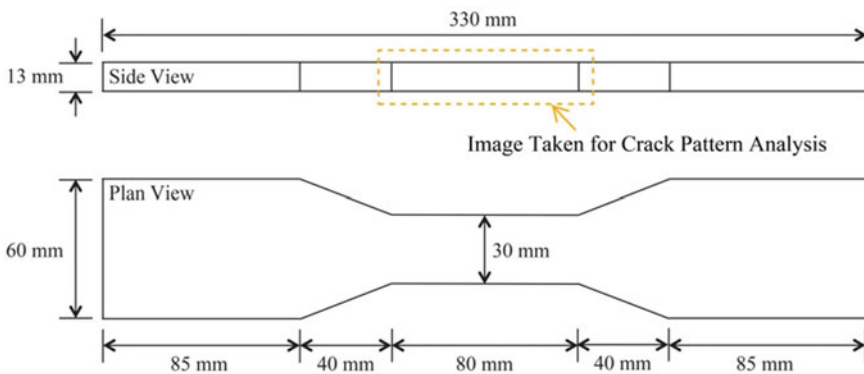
Dimensions of dumbbell tensile specimen recommended by JSCE
